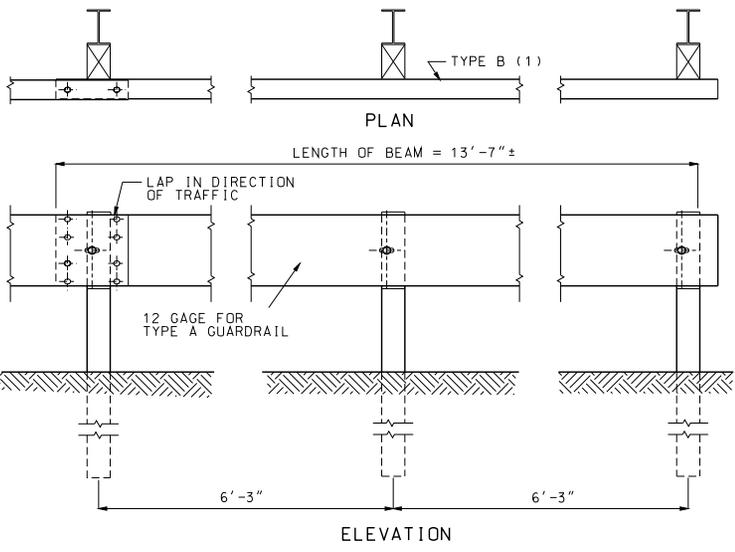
DETAIL FOR TRANSITIONING BETWEEN TYPE A AND TYPE B GUARDRAIL
